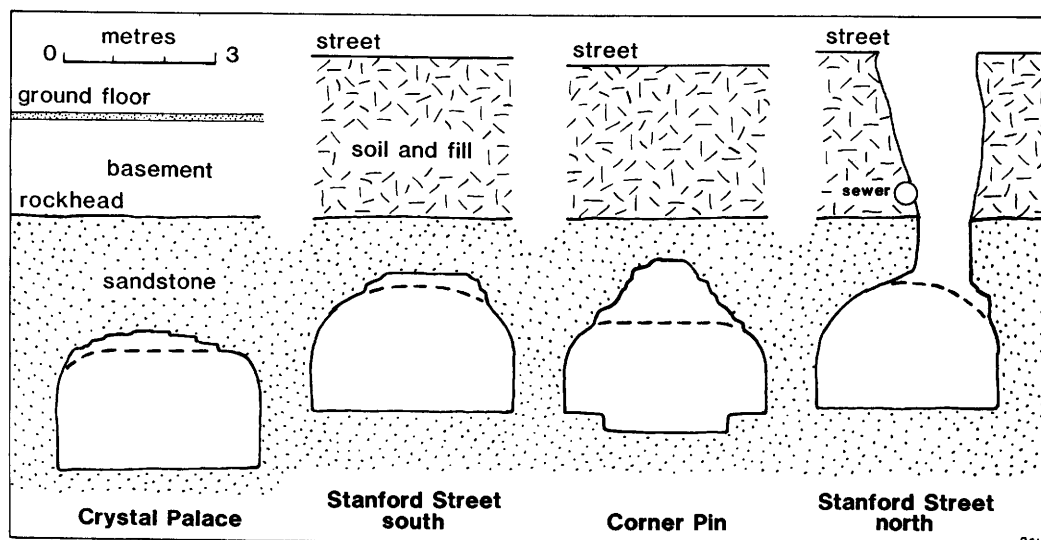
Cross sections through four 'caves', demonstrating progressive stages of roof failure, including the ultimate crown hole development at the north end of the Stanford Street caves.
